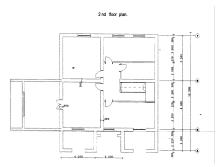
B: Plan of the Second Floor for a Typical Building shown in Figure 3  $\,$
